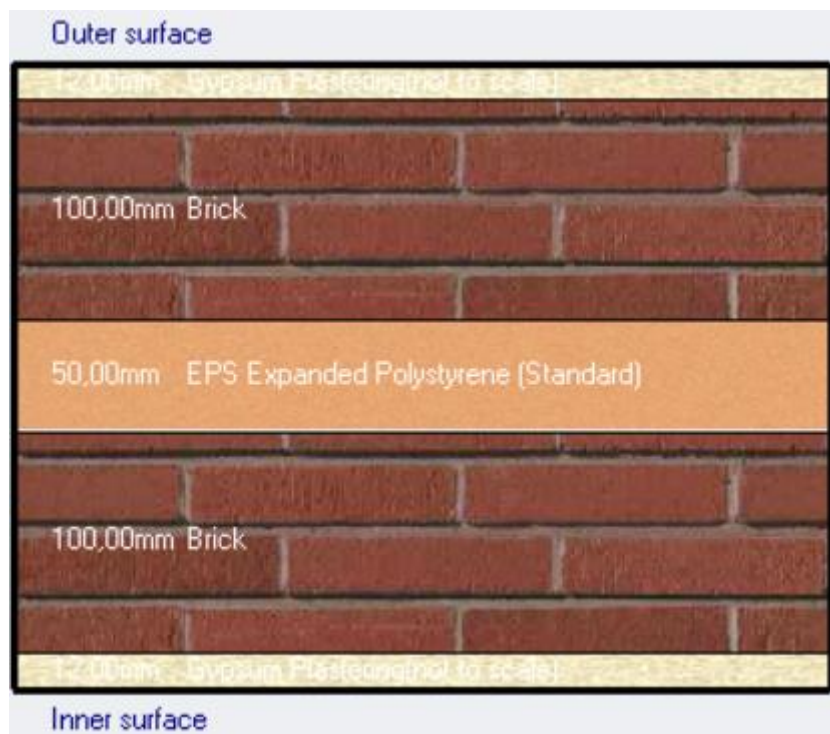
Detail of the separation wall between two dwellings of the terraced house in DesignBuilder. This detail applies to both the low and high insulation variants.
